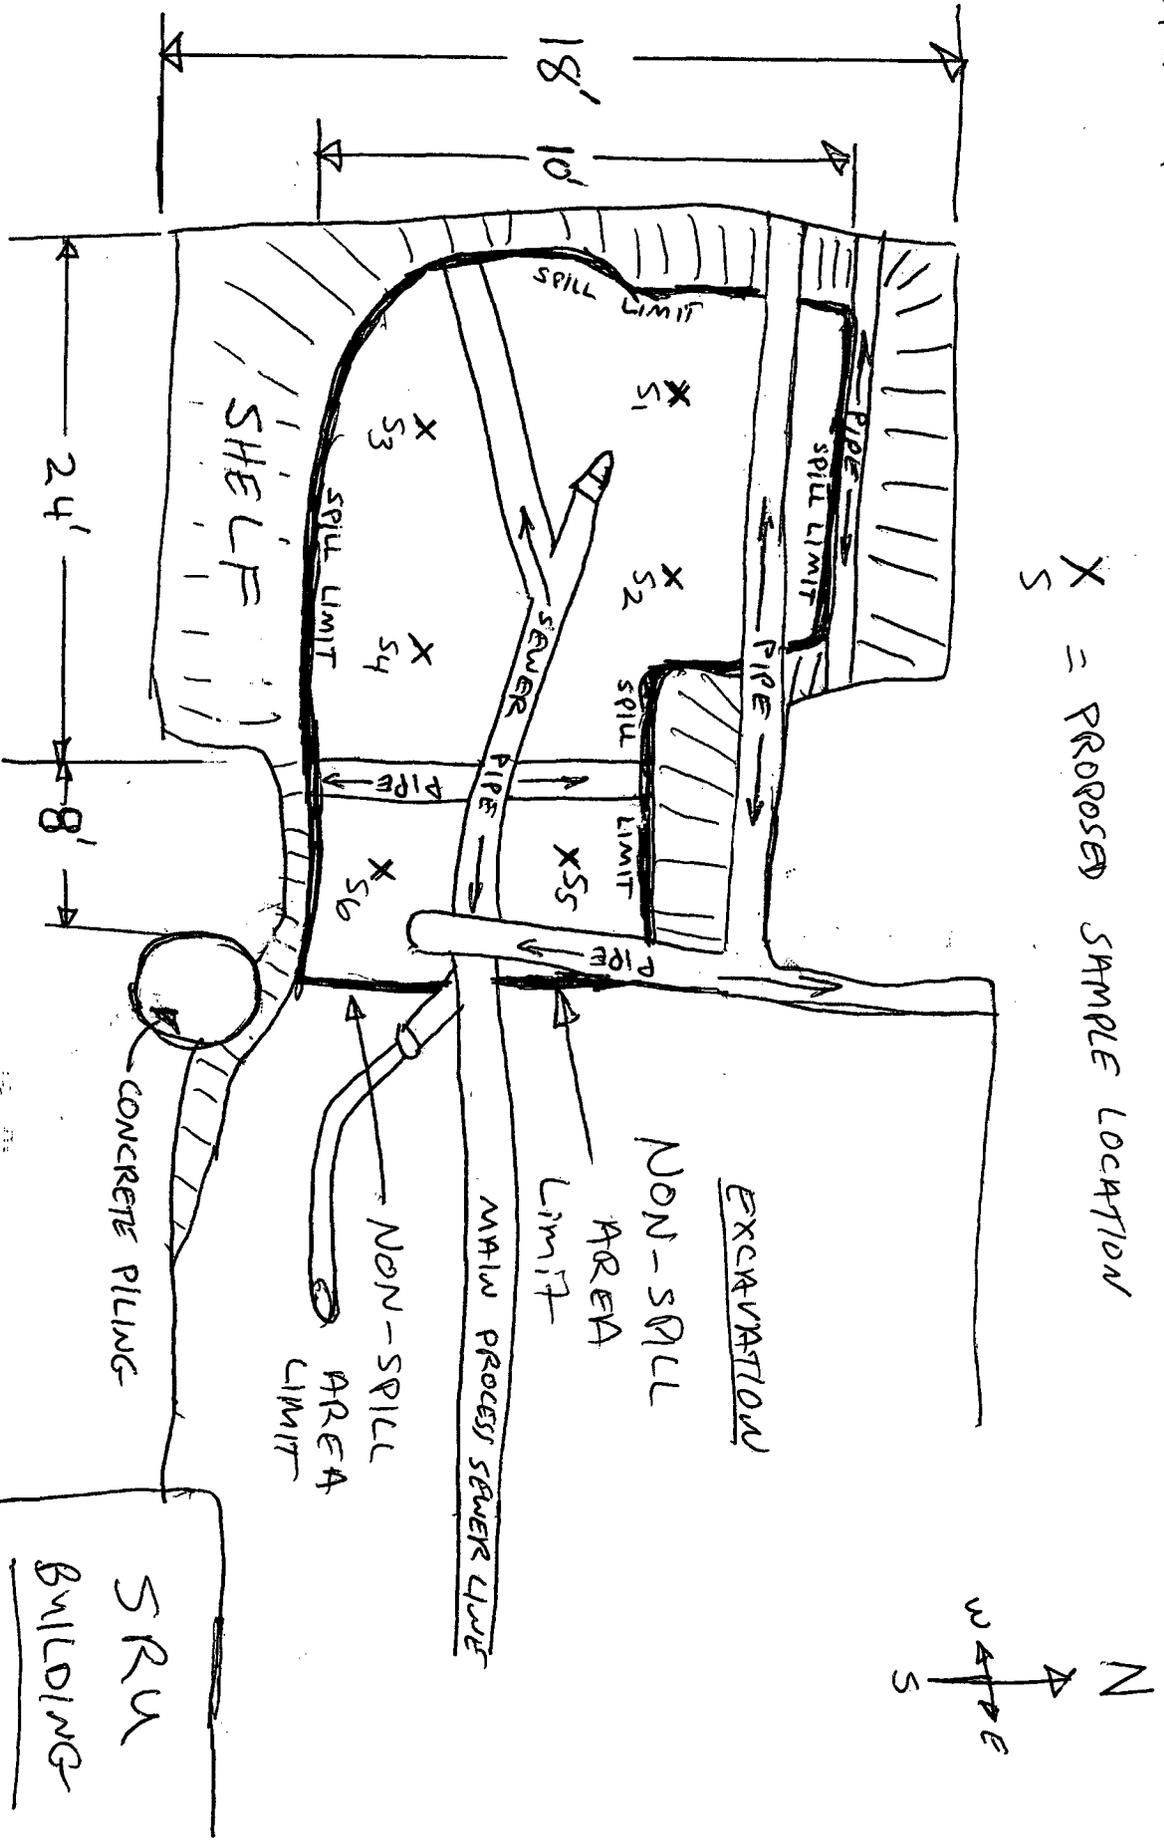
FIGURE: SEWER EXCAVATION SPILL SIM UEB 3-3-06
